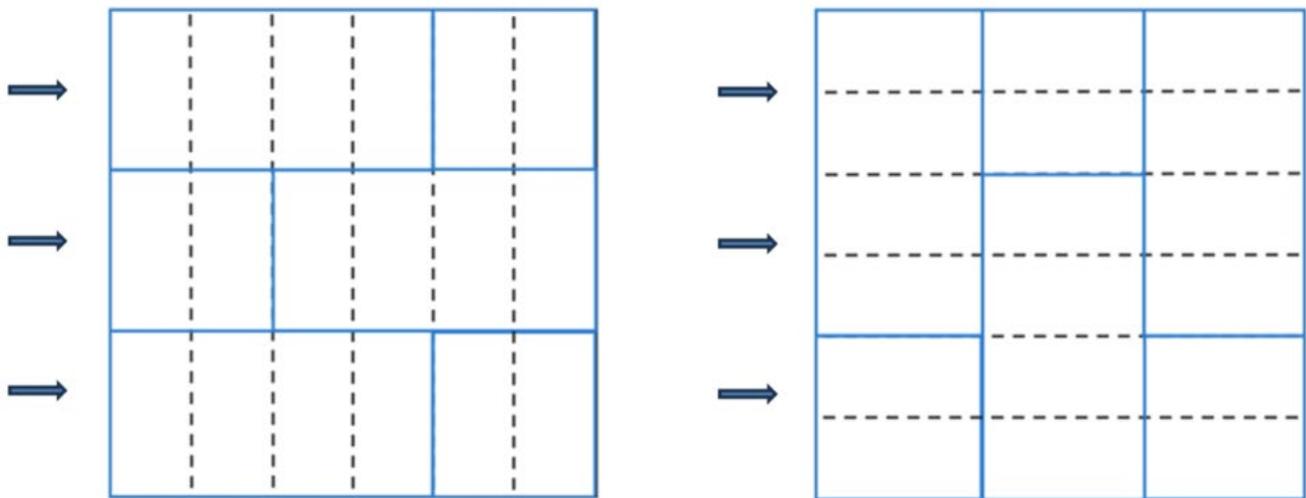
Cantilever Diaphragm Configuration For Load Applied Perpendicular To Joists (Left) And Parallel To Joists (Right)
